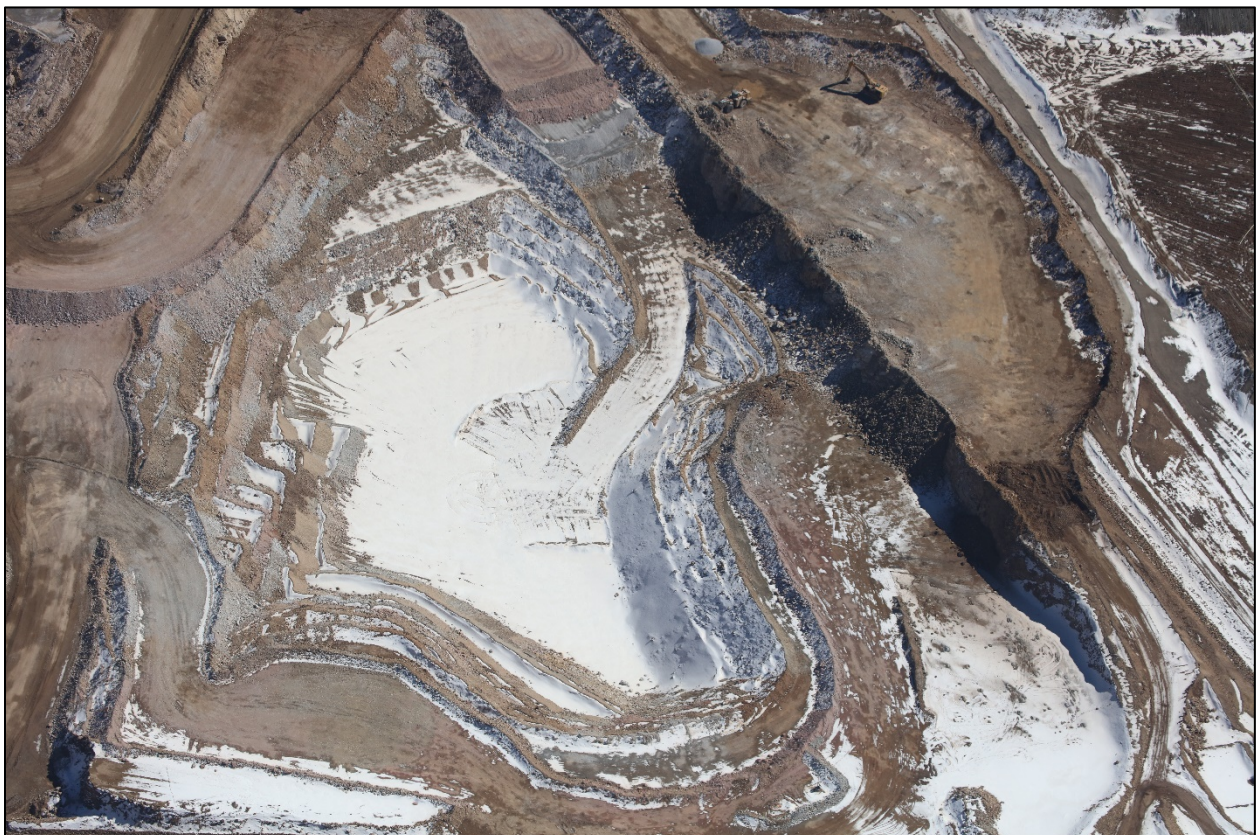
Backfilled area of Schist Island Pit for VLF 2 - Phase 3; looking east.
